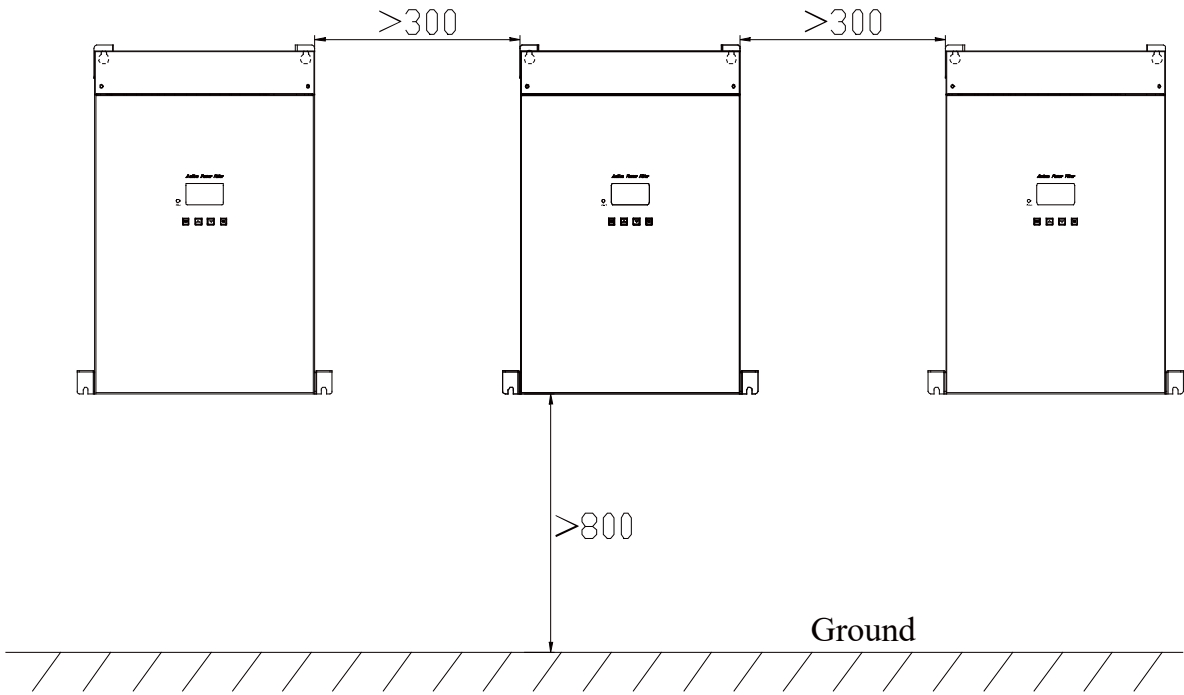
Filter arrangement installation diagram (unit: mm)
